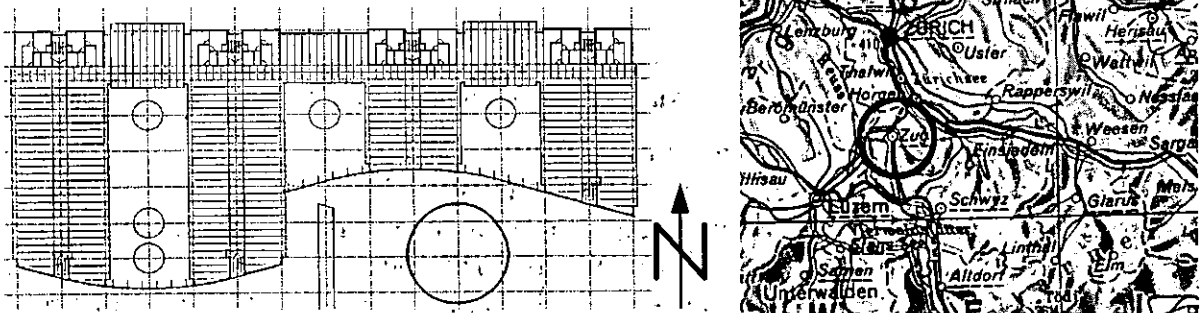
Above: Plan of Grafenau building, Zug.
